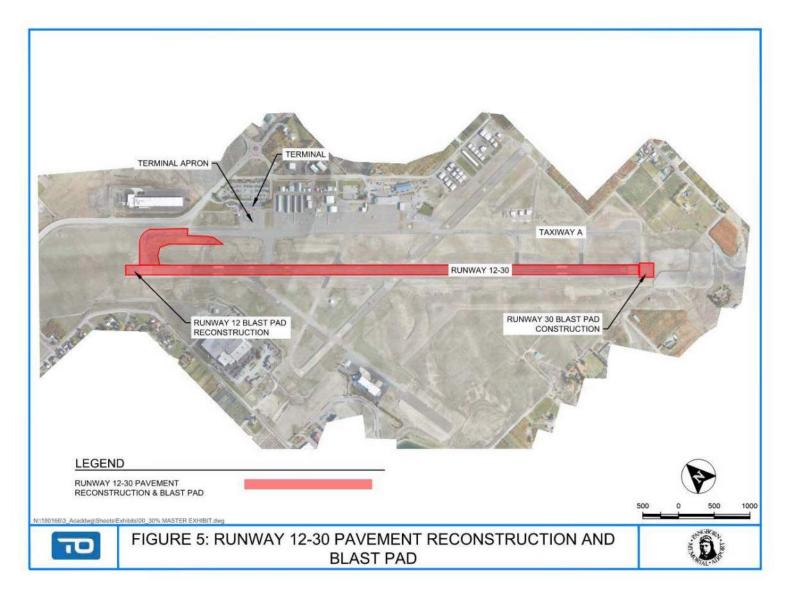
Runway 12-30 Reconstruction and Blast Pad, adapted from Proposed Improvements Exhibit, (dated 1/29/21)
